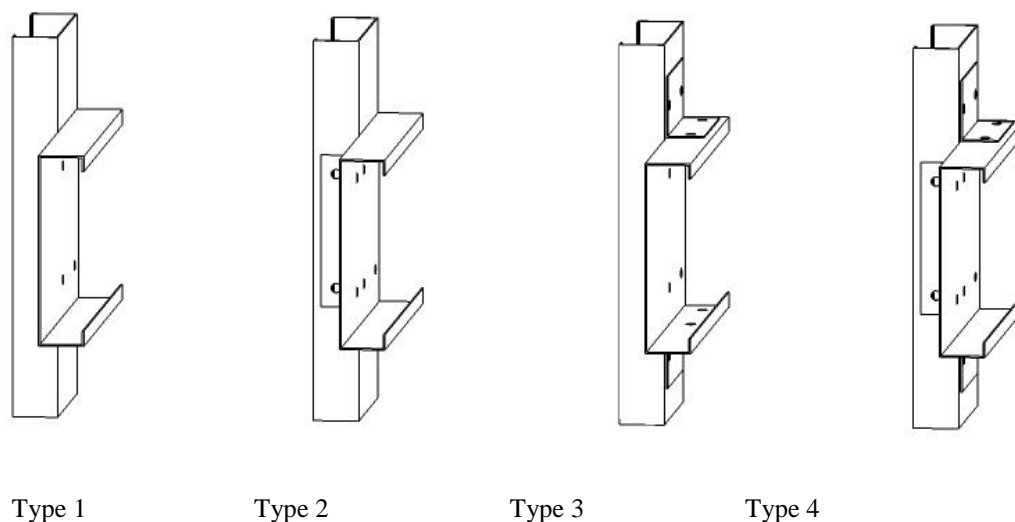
Beam-to-column joints after Hazlan et al. (2010)
